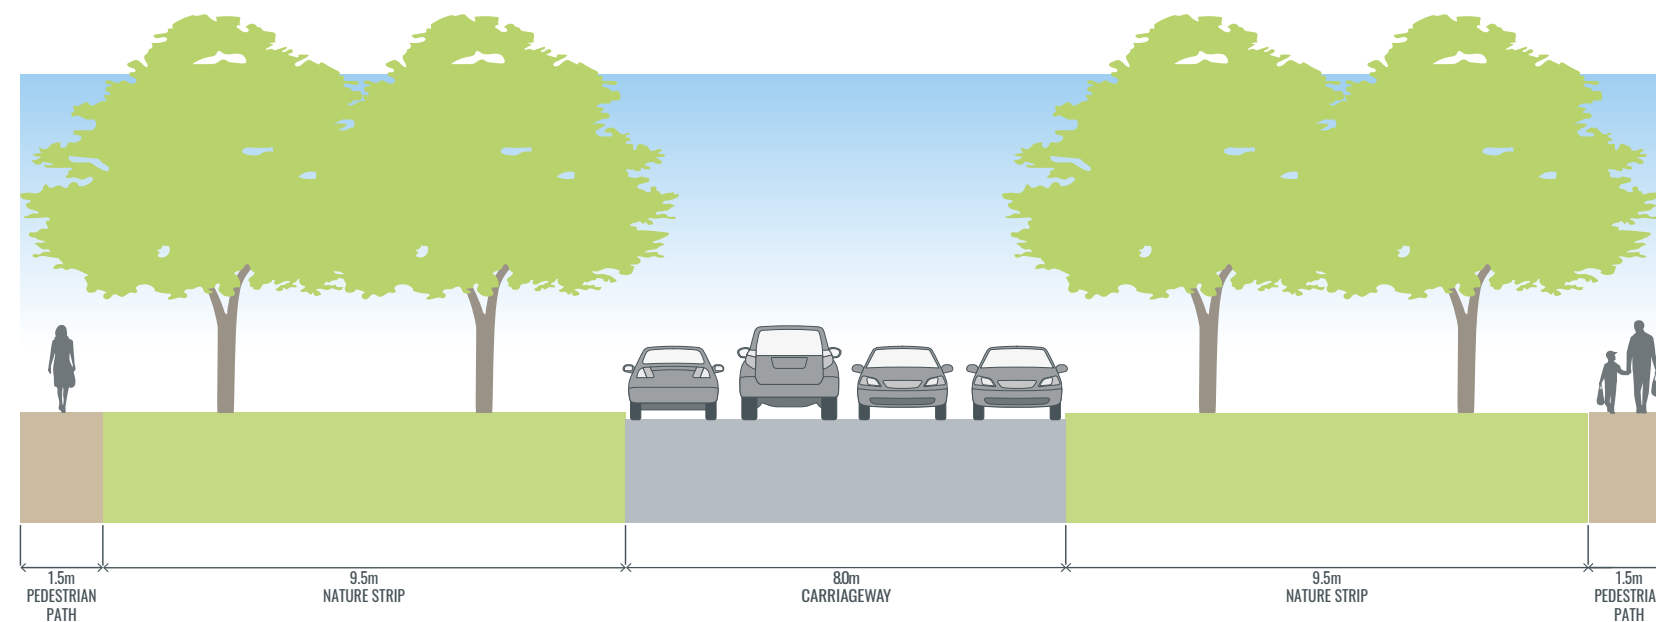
LOCAL STREET - EXISTING (30.0M)
